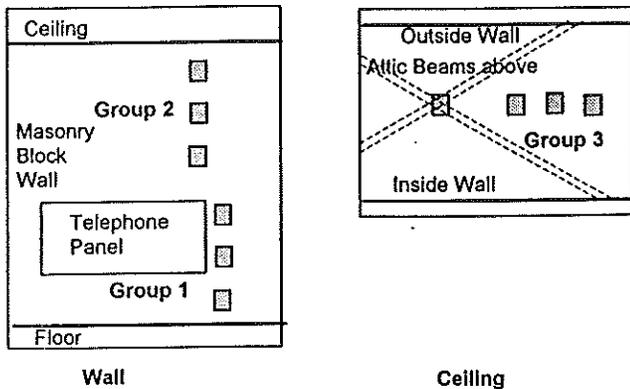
Location of sensor sites at the Fort Drum, N.Y., masonry building. (Not to scale.)
